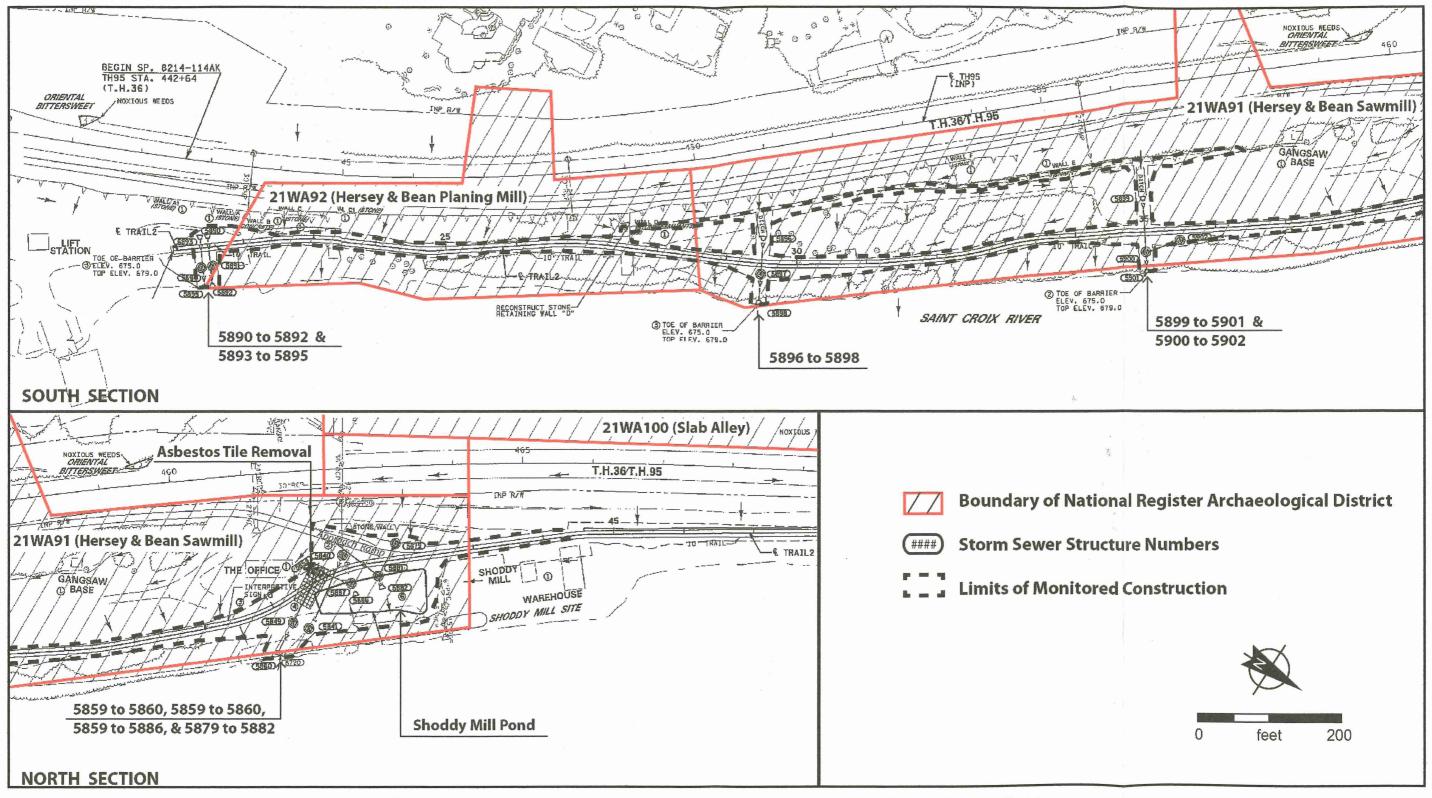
AREAS OF ARCHAEOLOGICAL CONSTRUCTION MONITORING ON LOOP TRAIL PROJECT DRAINAGE PLANS
